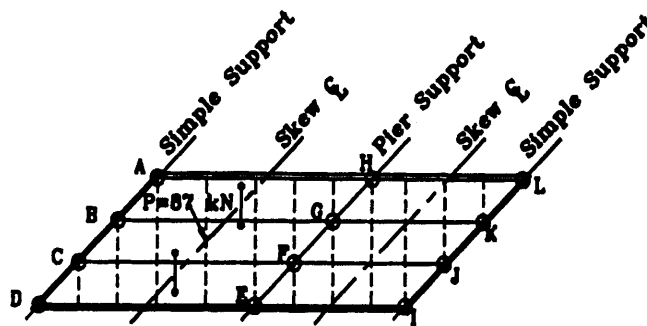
Details for Continuous Bridges Tested (Ebeido et al. 1996)
